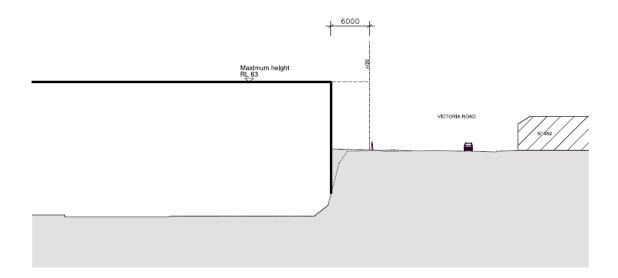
Section E Victoria Road street frontage setbacks.
